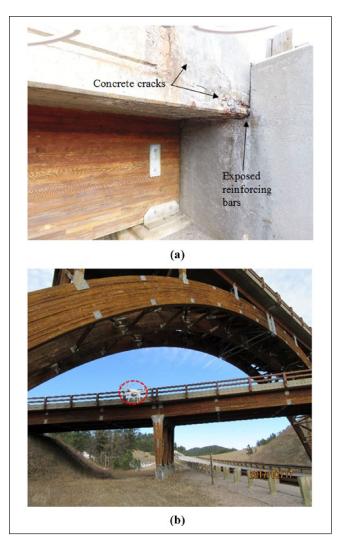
Sample images obtained from the timber girder bridge inspection on February 17, 2017: (a) concrete cracking and water damage at abutment location and (b) UAS approaching the bridge (captured by Junwon Seo).
